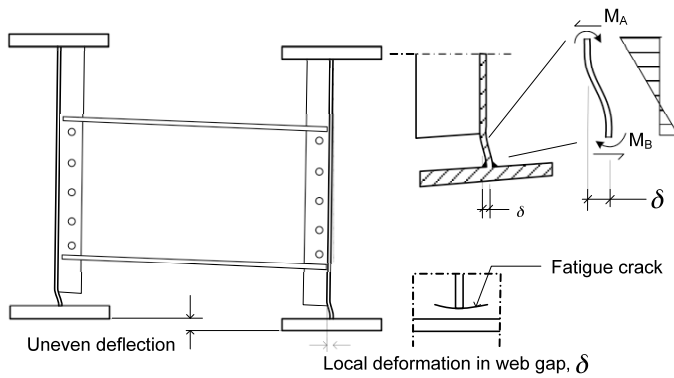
The differential deflection of bridge girders results in high local bending stresses in unstiffened web gaps between the girder flange and the termination of cut-short connection plates.
